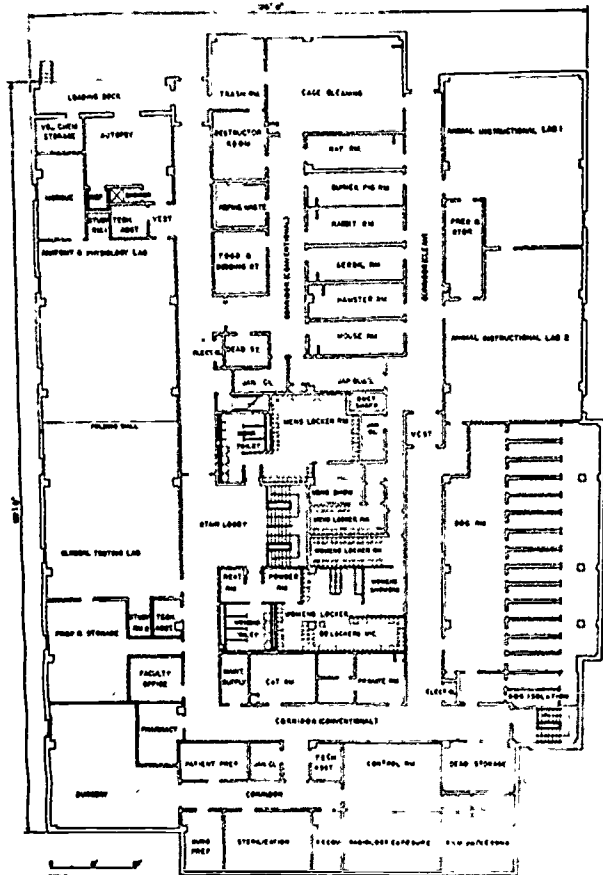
A FACILITIES PLAN FOR VETERINARY SCIENCE TECHNOLOGY
